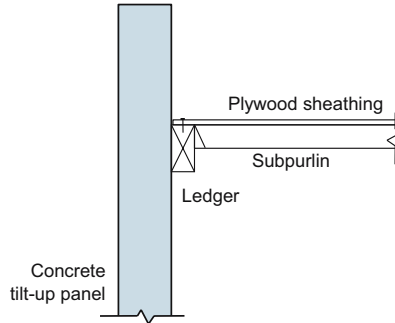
Typical wall anchorage details in tilt-up buildings constructed before 1971
